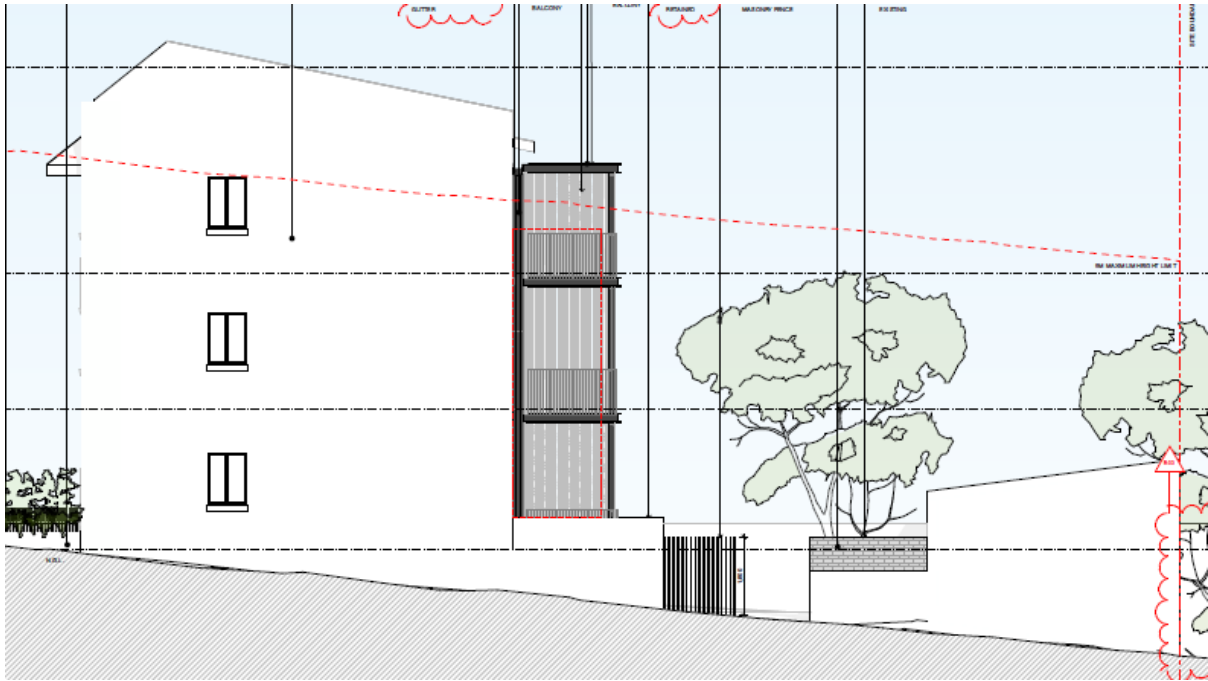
Proposed photomontage of rear elevation with new balconies
